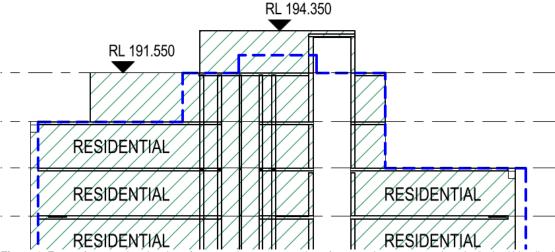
Extract from section drawing of proposed concept envelope (approved concept envelope in dashed blue line).
